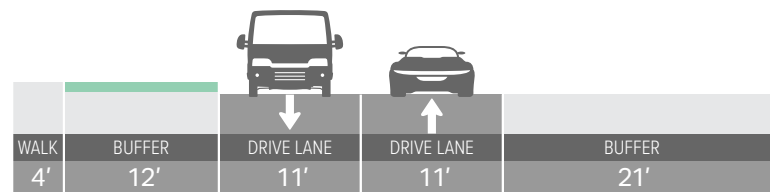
Existing Cross-Section Winter Street to Crockett Street
